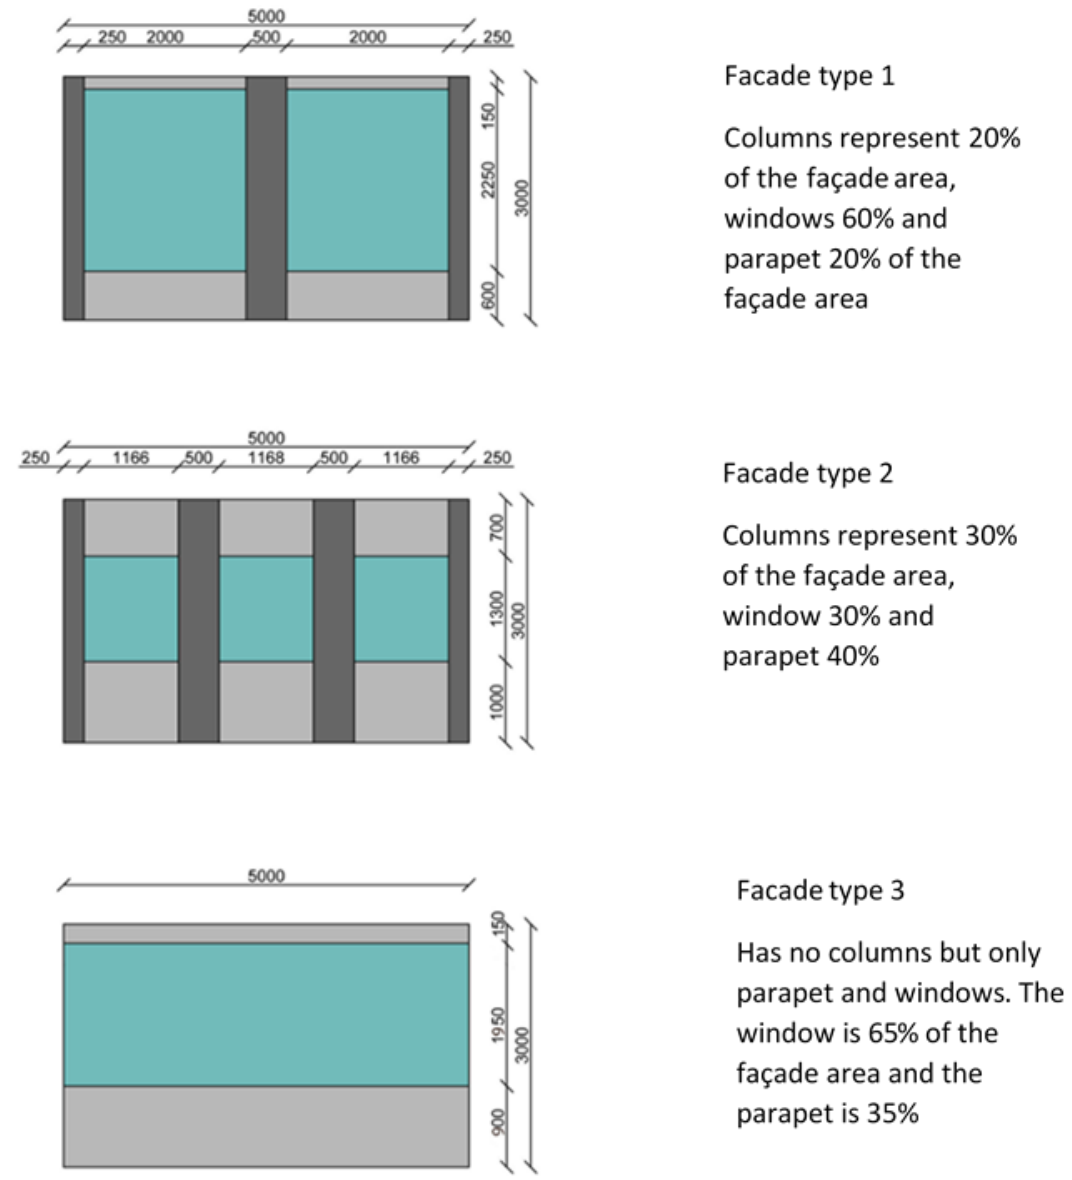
The three façade types: façade type 1, façade type 2 and façade type 3
